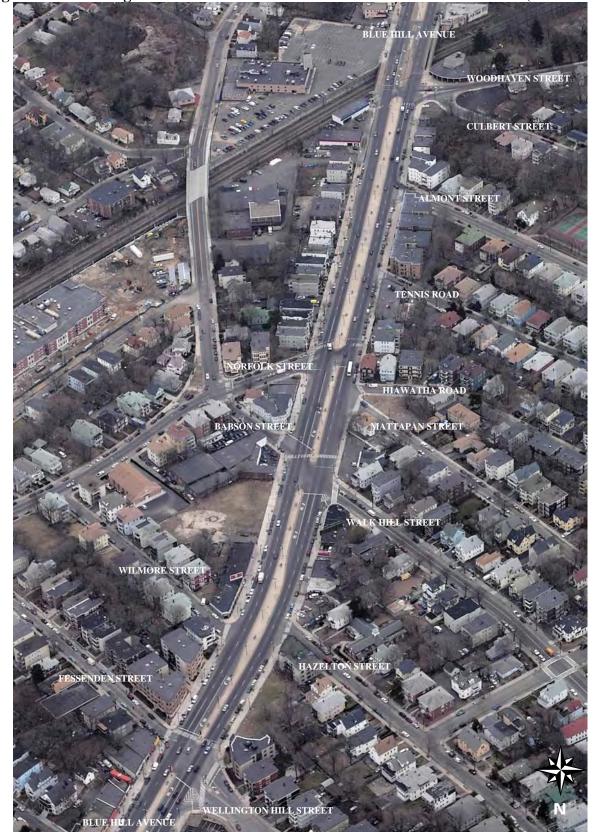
Wellington Hill Street to Woodhaven Street via Blue Hill Avenue (South View)
